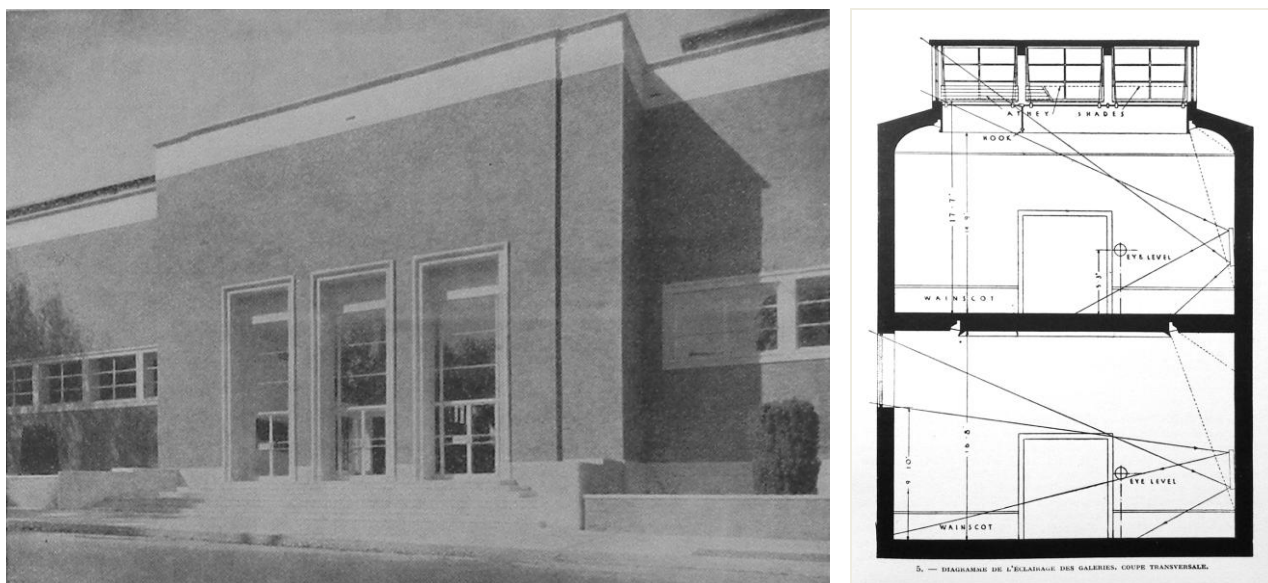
Portland Art Museum: façade and cross section showing the lighting system
